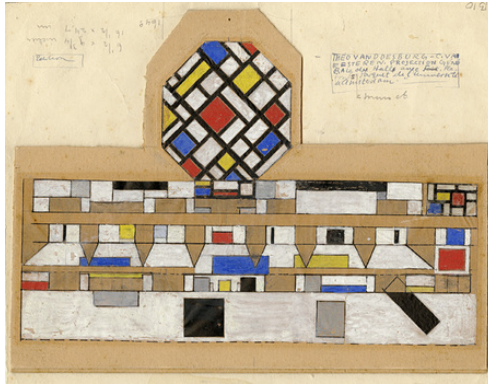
Theo Van Doesburg: Colour design for the floor, walls and ceiling.¹⁵⁶
